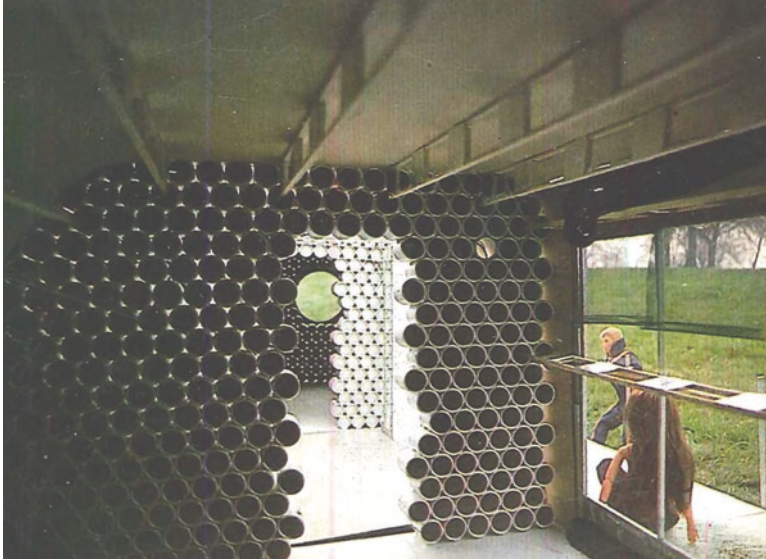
Two-person dwelling, SUG, view of the living room area, tin-can wall and beams. (Source: Kan 1978)
